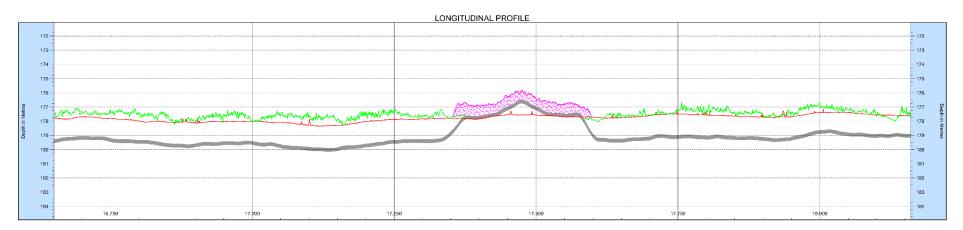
PL4556 As-built alignment sheet KP16.650 to KP18.160
